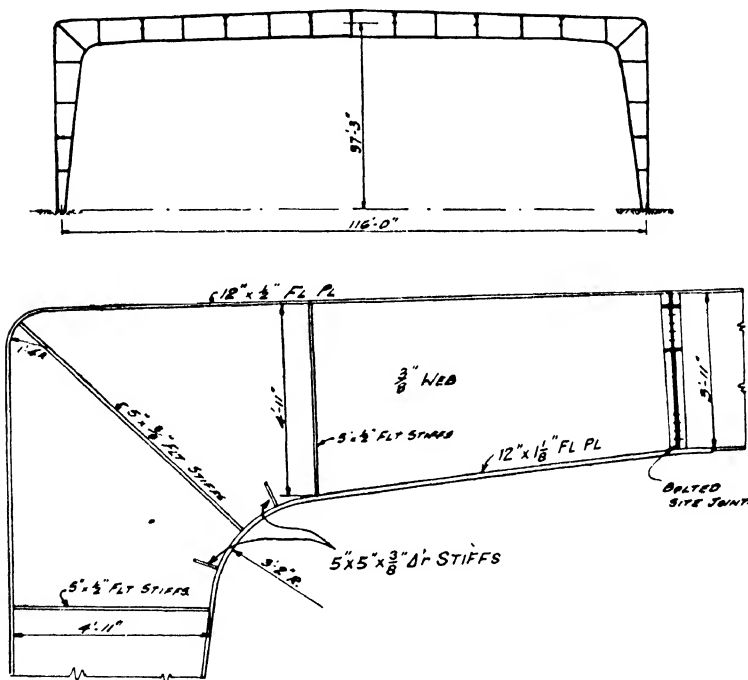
TWO-HINGE PORTAL FRAME OF 116-FT. SPAN
